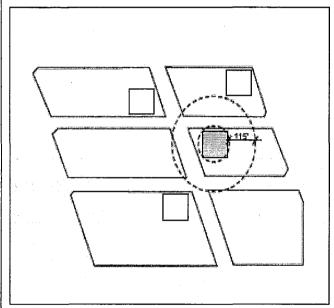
w: Eastside building separation example (minimum of 115 feet)
